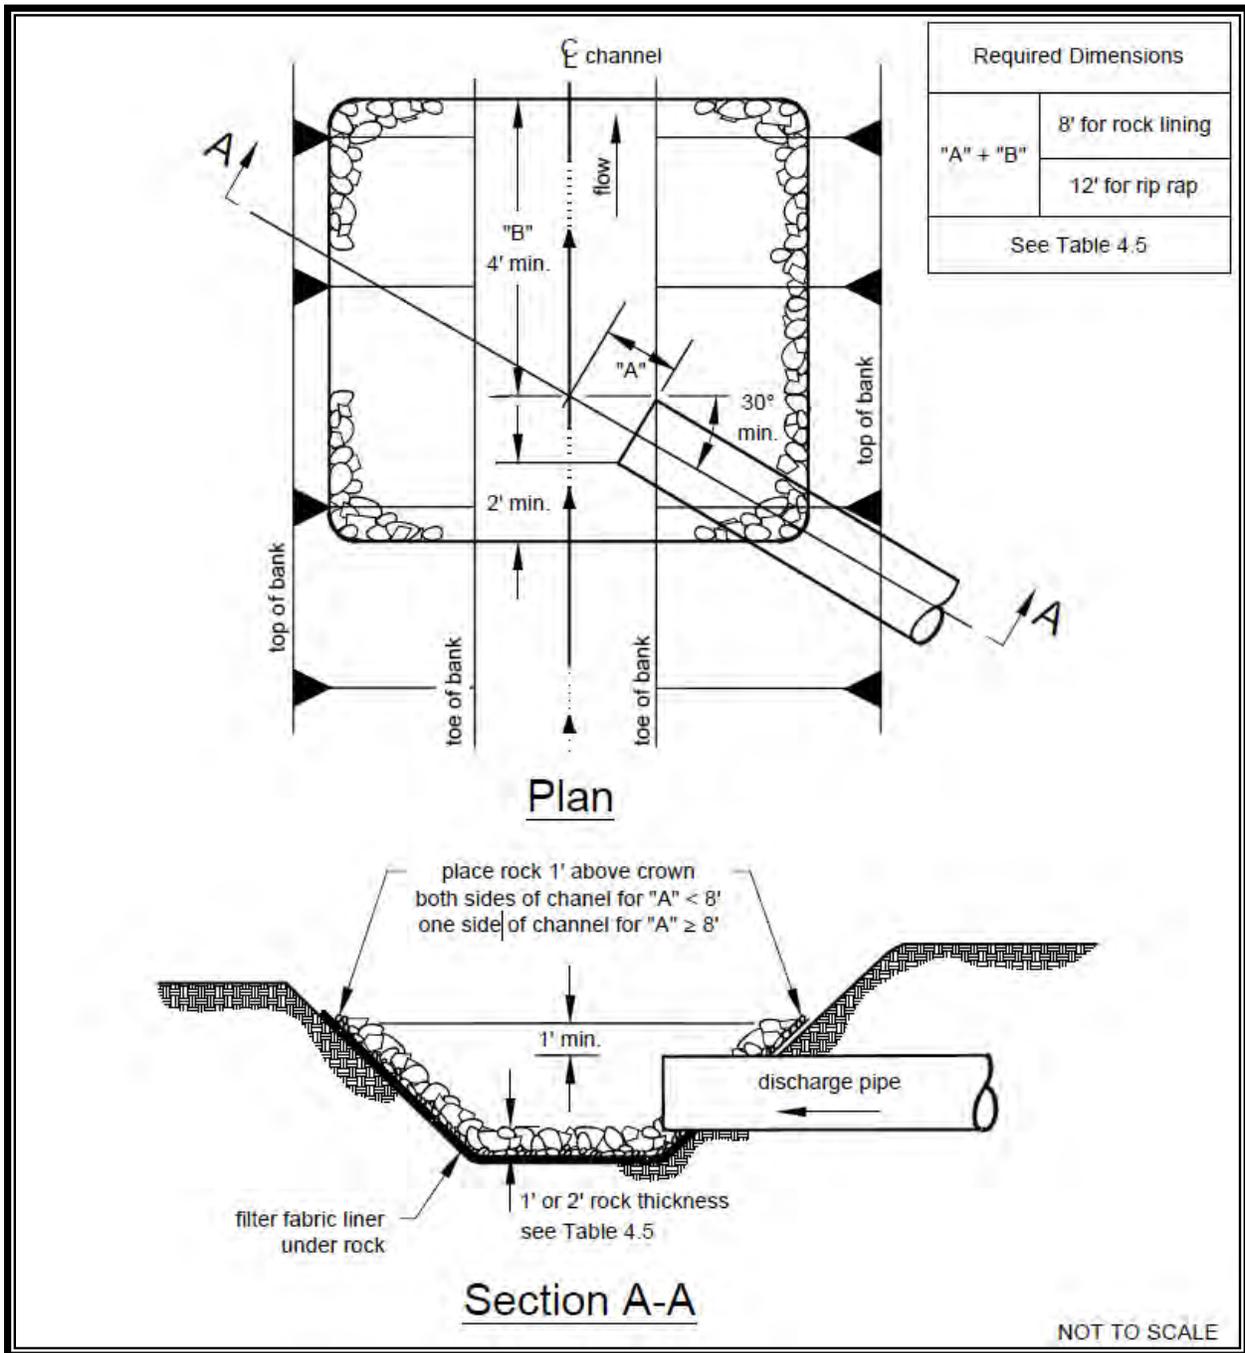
Pipe/Culvert Outfall Discharge Protection.
